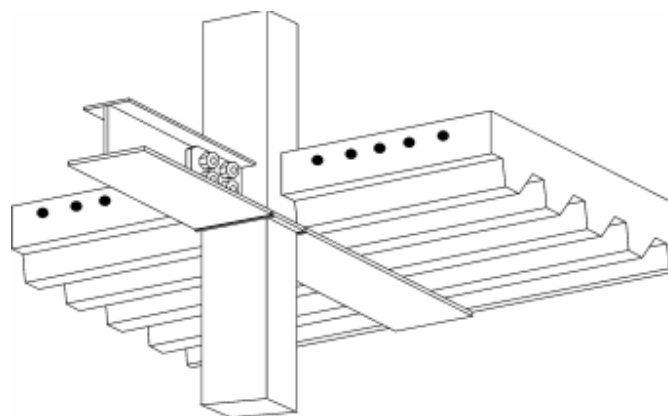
An example of slim floor system with cast-in-place concrete slab. [29]
